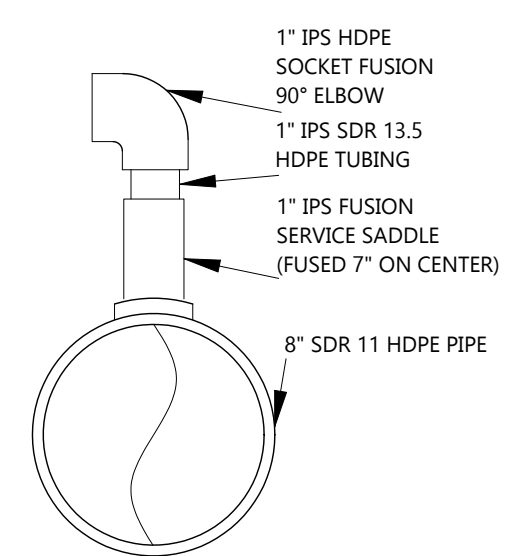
, D3): INFLOOR SENSOR DETAIL
